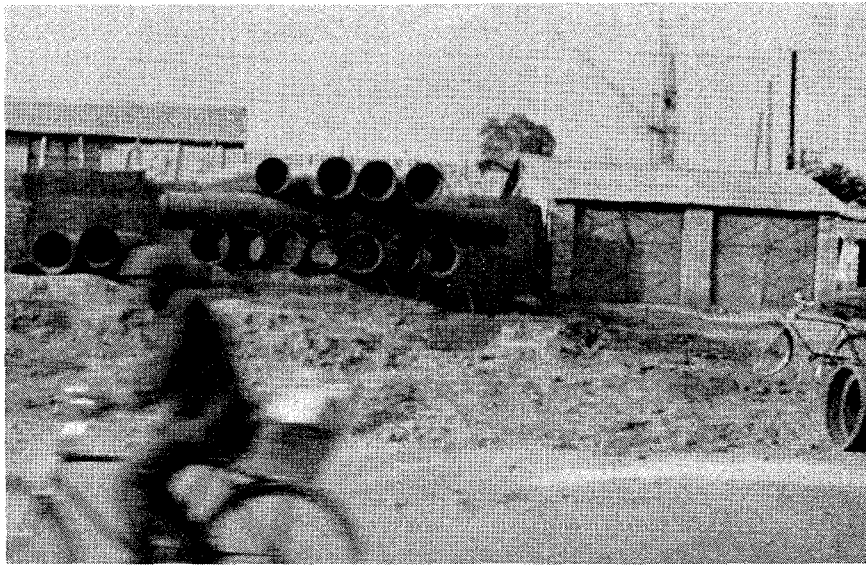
Reinforced concrete pipes to be used in reconstructing the Tangshan water supply lines.
